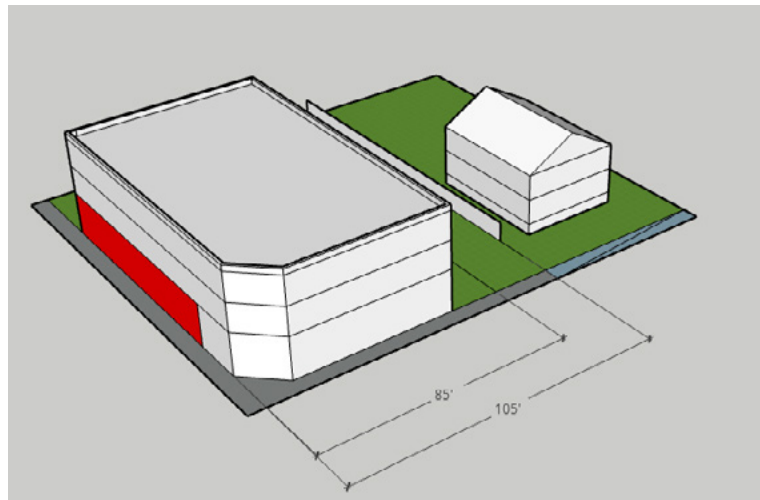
B: Example of parking setback relief for significant infill buildings
